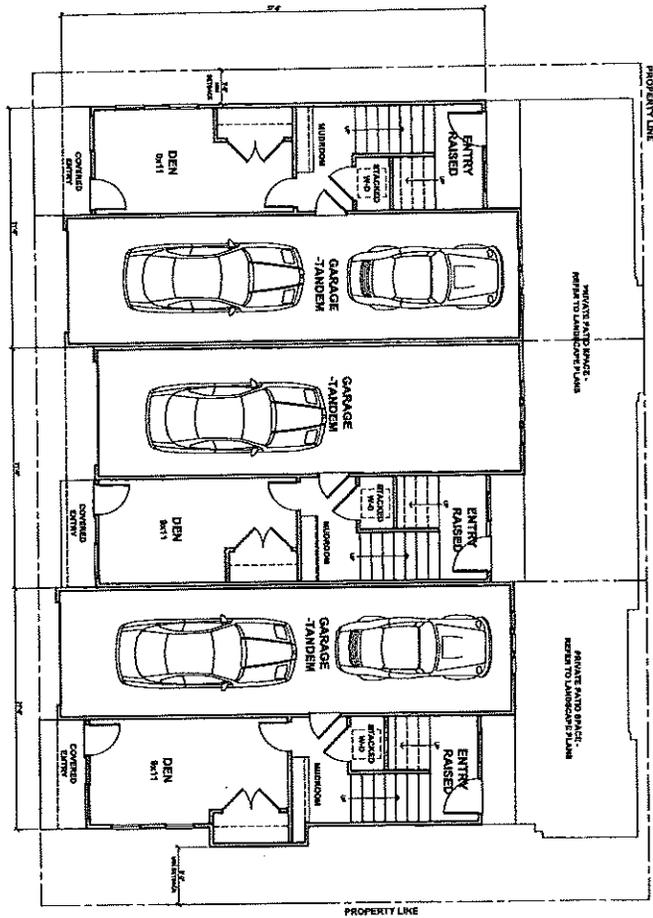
Exhibit YY: South Block: Rowhouses (Lots 11-45) Lower Floor Plan
